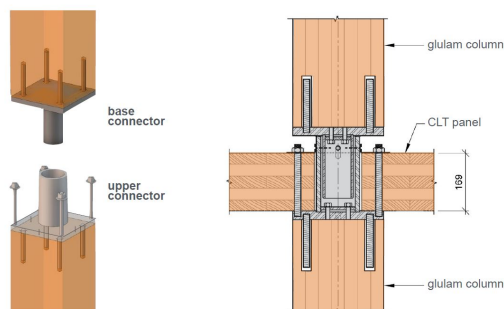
Connection detail, Tall wood building, UBC Brock Commons Vancouver (Pilon et al., 2016)
